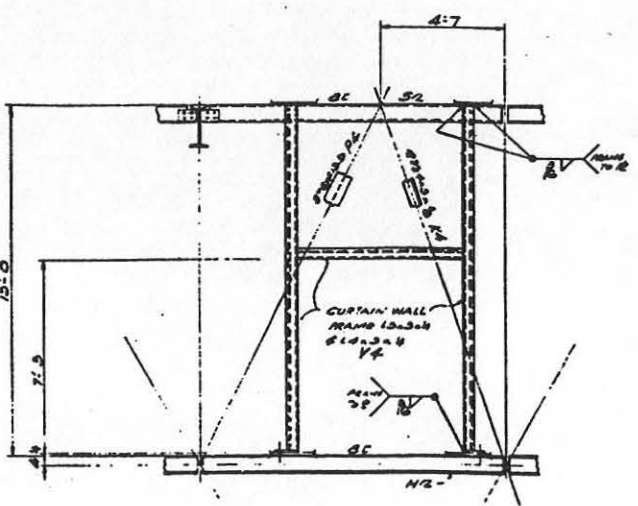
SEE NO SCALE 2-5-31, 2-5-31 & 2-5-32
